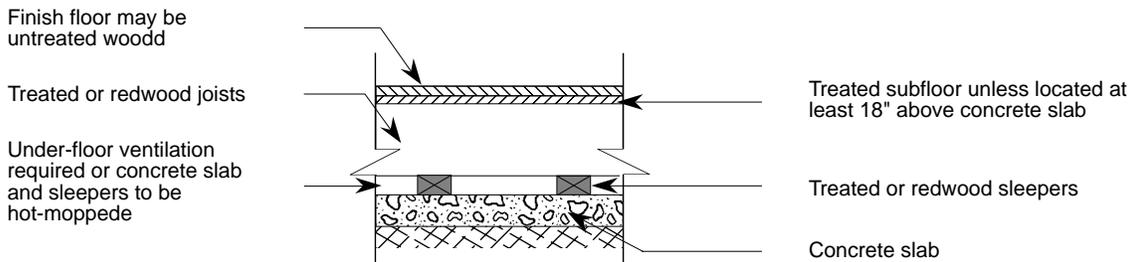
/Raised wood floor over concrete slab with no waterproof membrane
